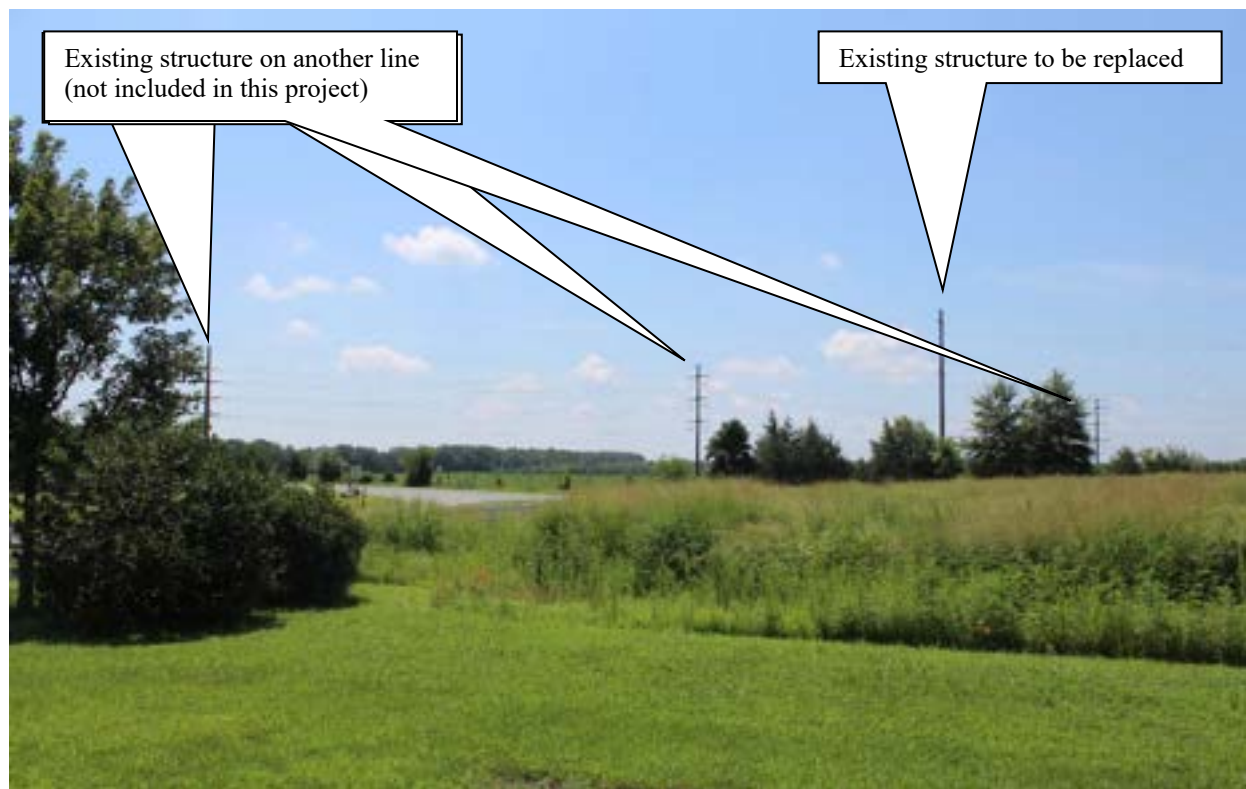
Photo location 5- View from Rose Hill Farm driveway (One existing project structure and multiple structures on another line visible), facing southeast.
